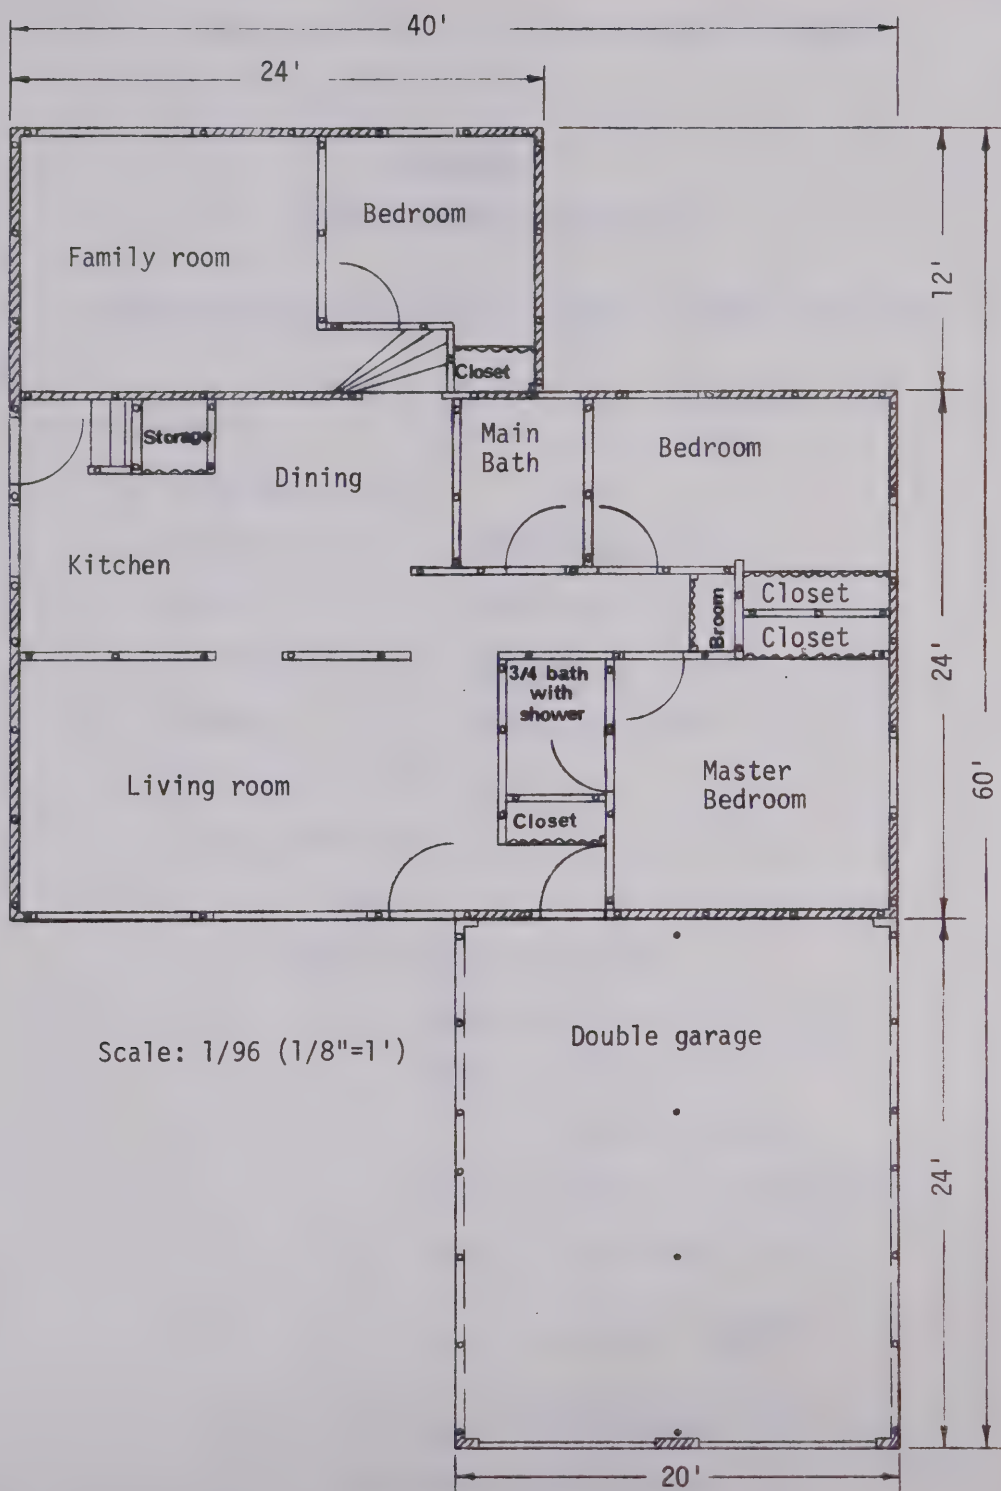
1248 square feet three bedroom floor plan including 288 square foot extension, and a double garage
